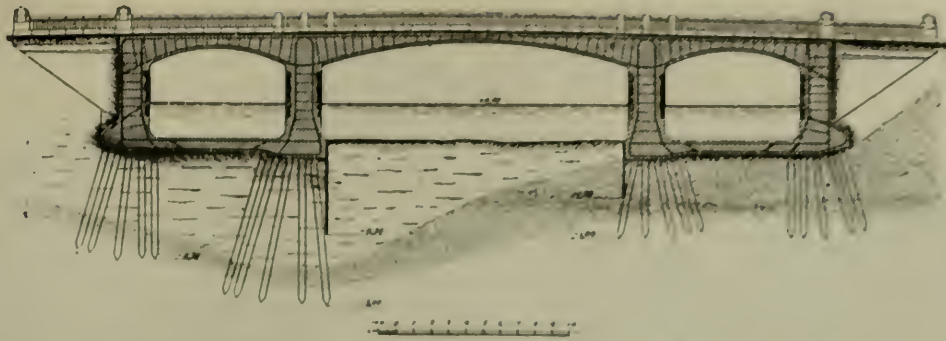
LANGENZUG BRIDGE: SECTION SHOWING FOUNDATION PILES DRIVEN INTO CLAY. SPANS 60 FT. AND 30 FT.
